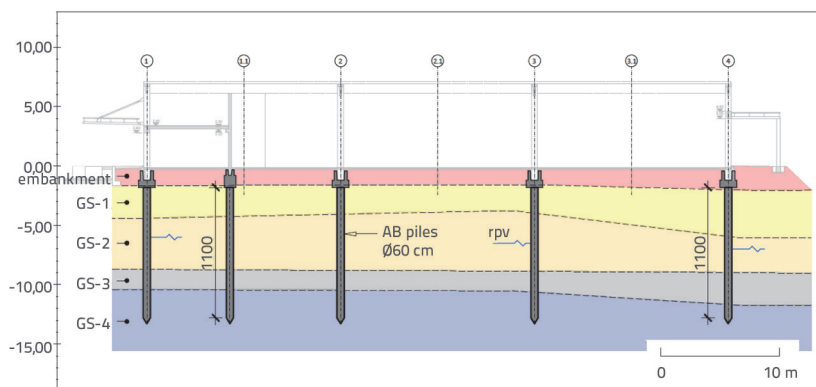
Characteristic cross-section of the structure and piles, and geotechnical soil profile (PLODINE)
